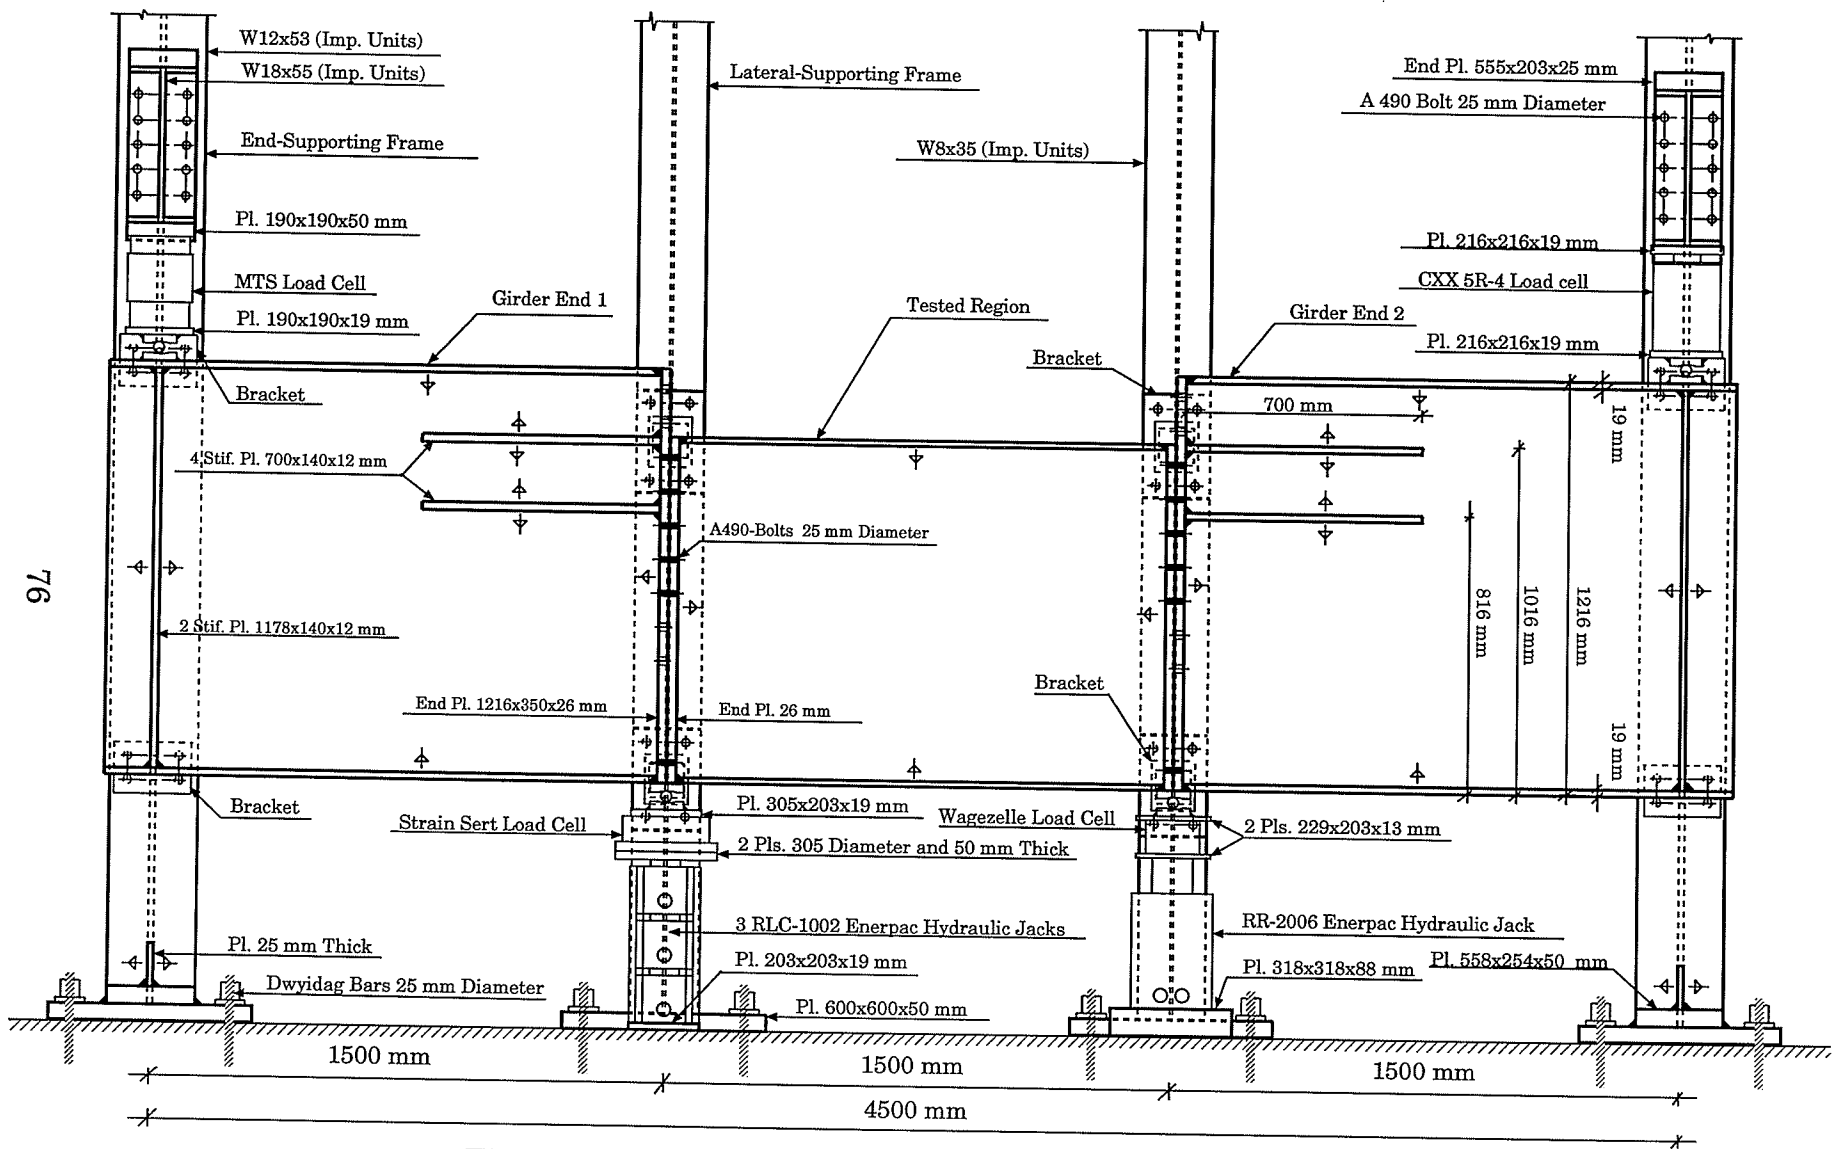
Elevation of the Test Setup and the Tested Girder
